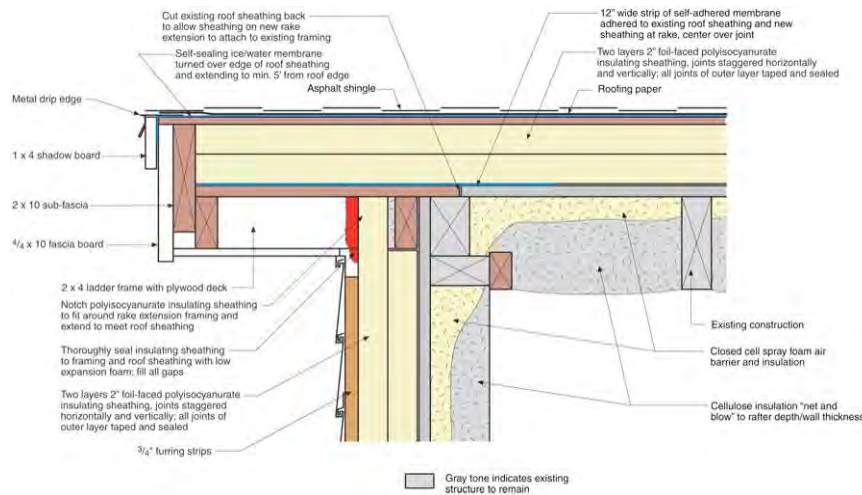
Roof-wall intersection detail drawn to guide correction of drainage plane and air barrier transition
